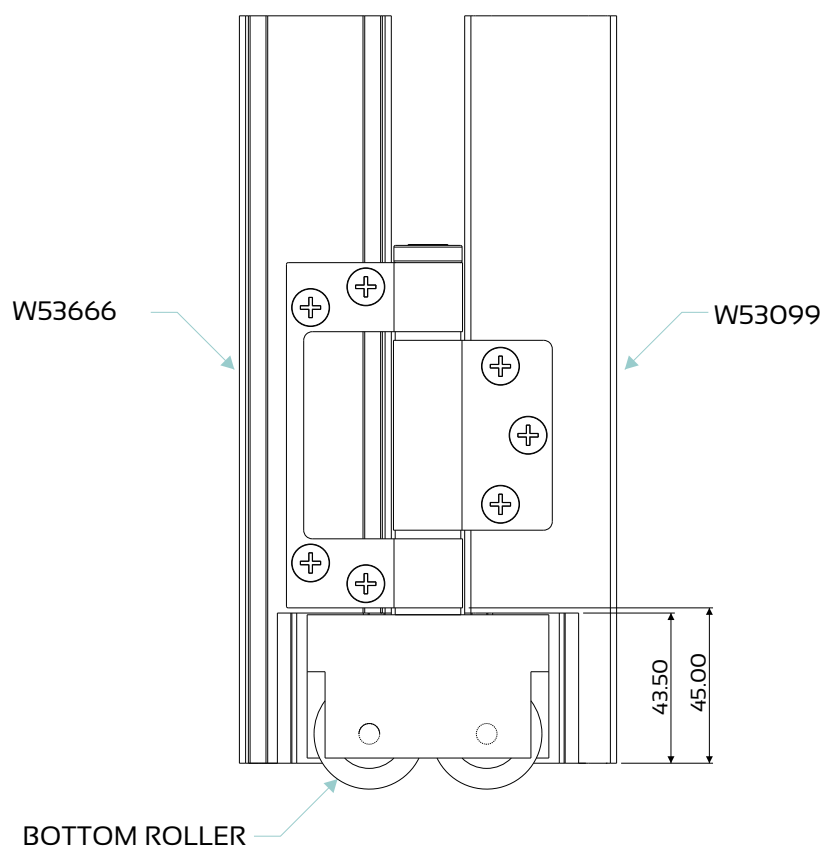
DETAIL TYPICAL TO HEAD AND SILL OF DOOR
